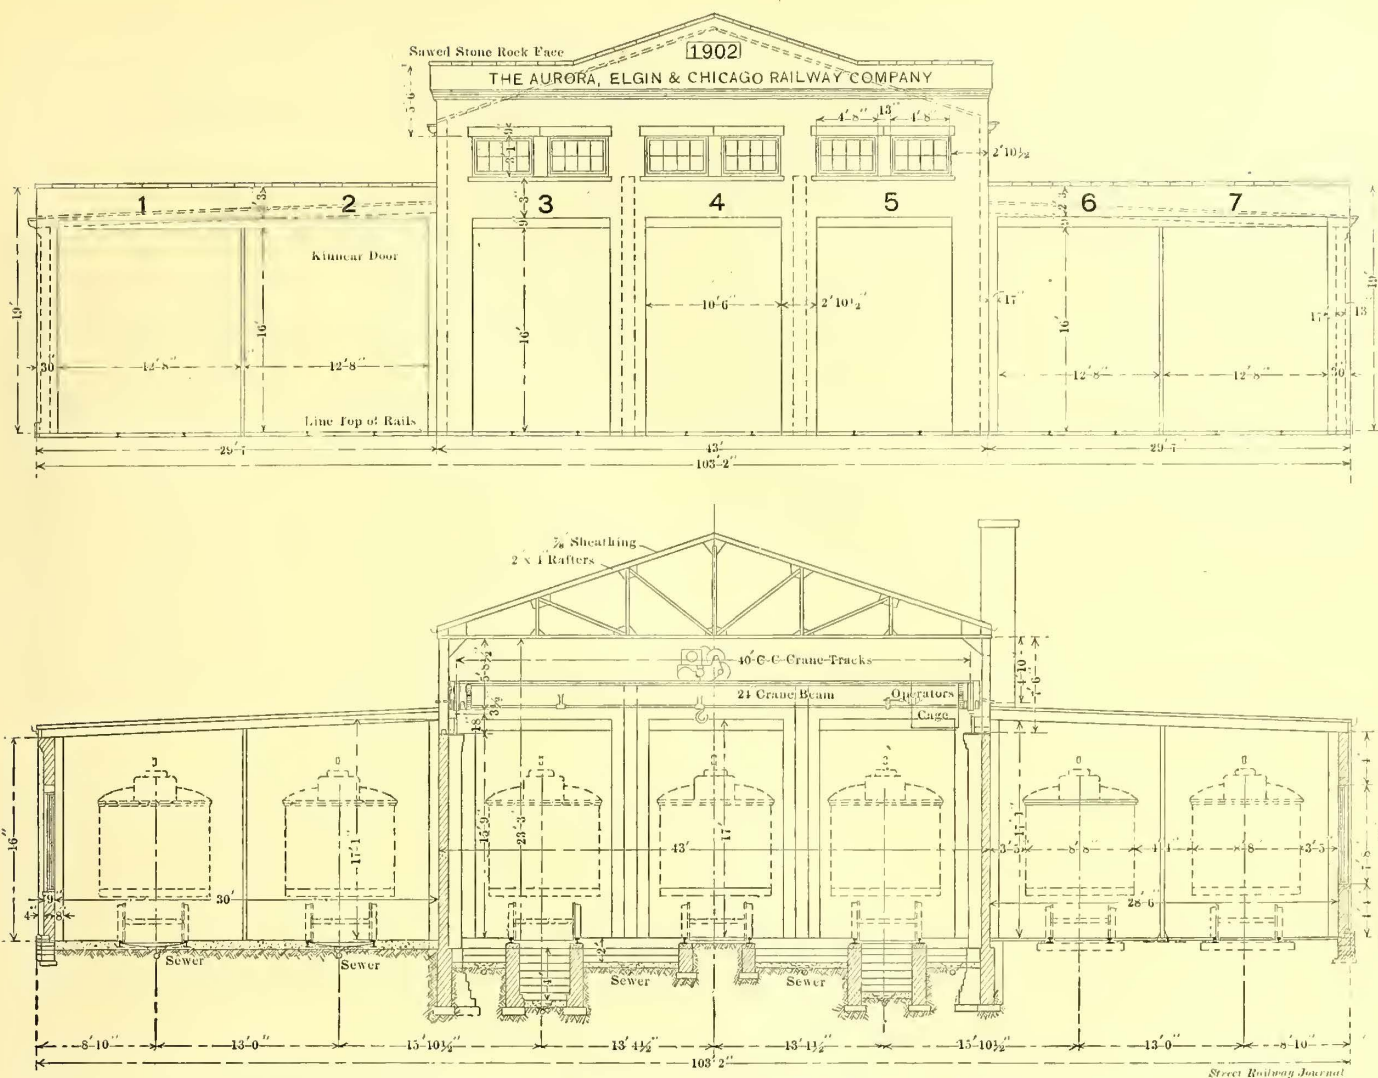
FRONT ELEVATION AND SECTION OF CAR HOUSE
